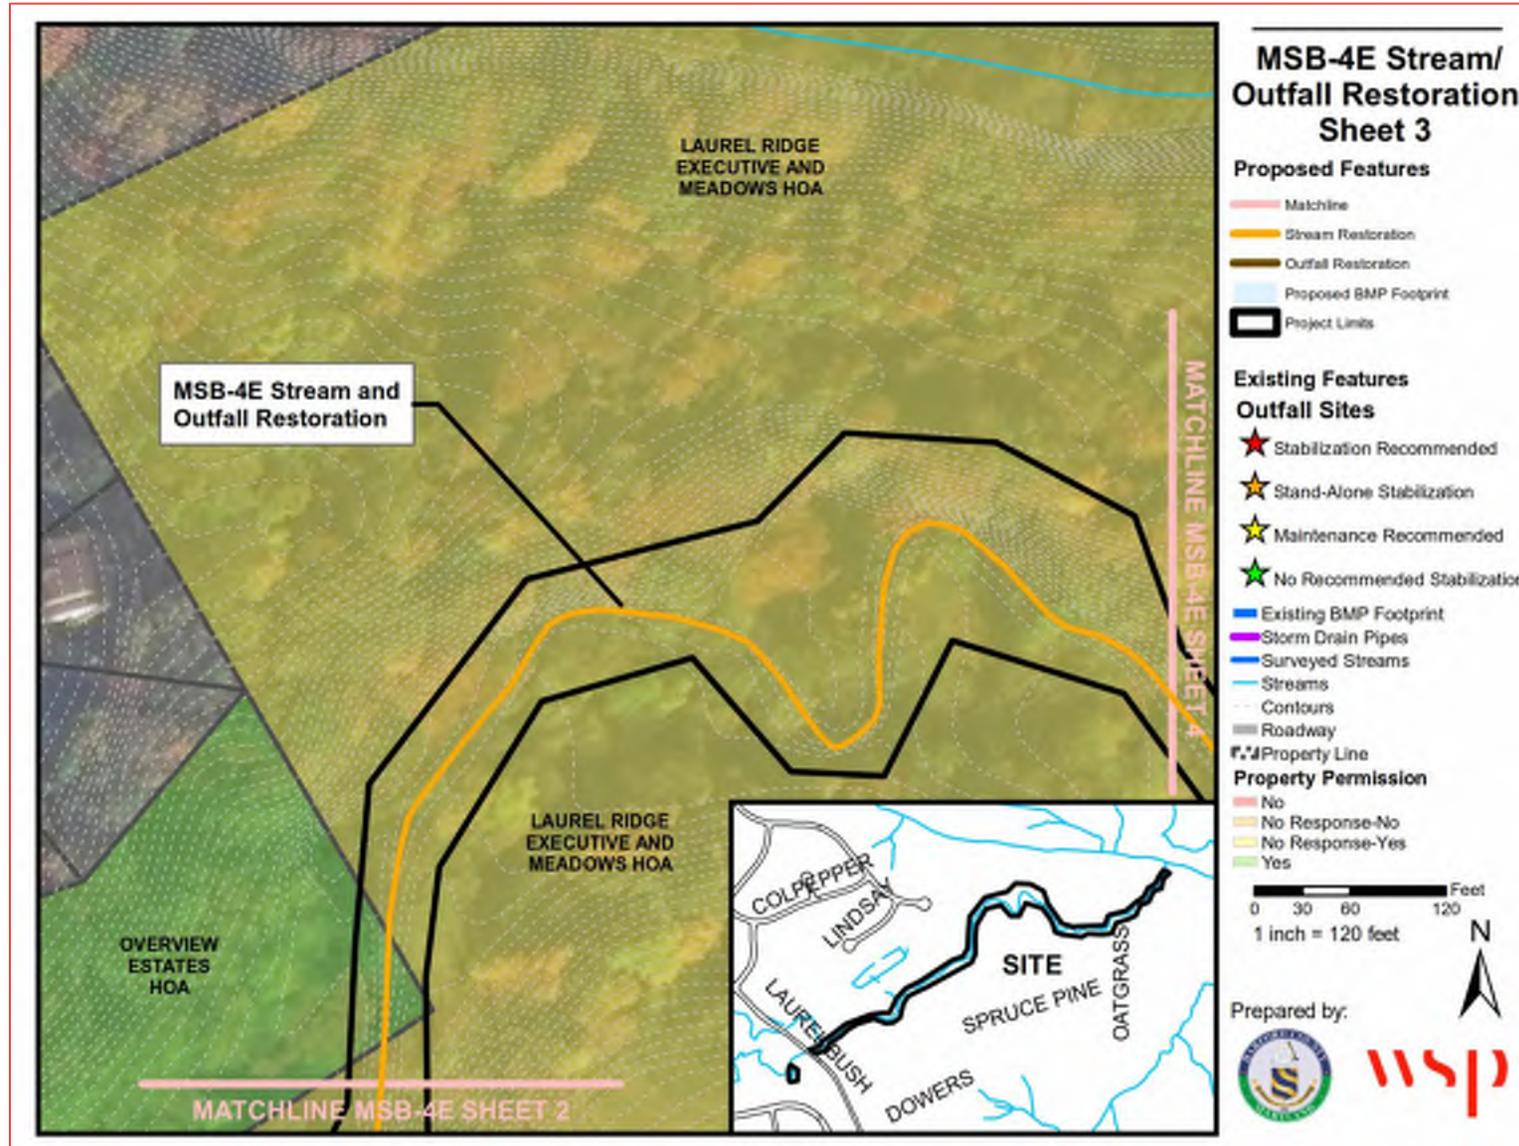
Site Location and Proposed Project Plan for MSB-4E Stream and Outfall Restoration (Sheet 3 of 5)
